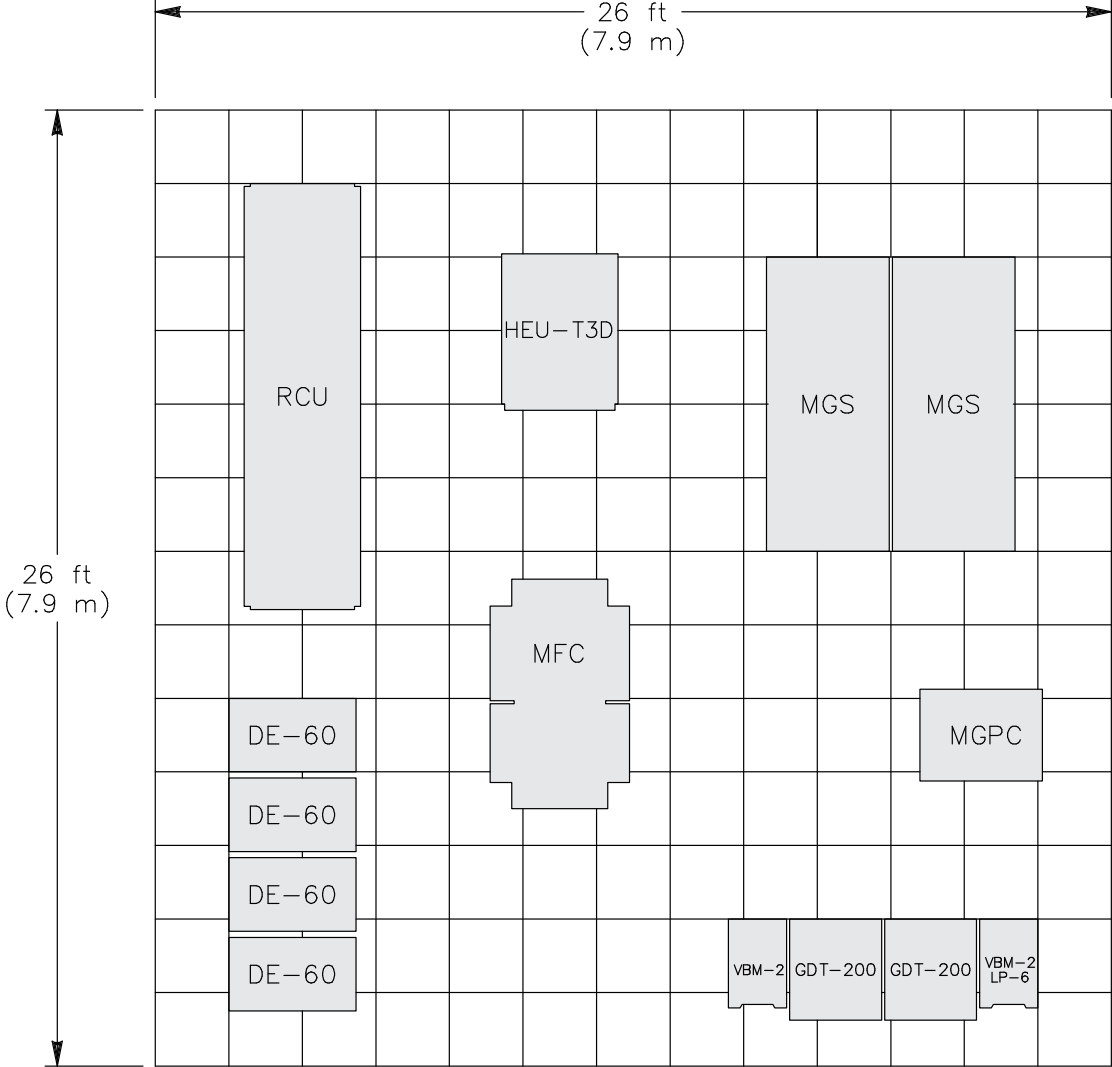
CRAY T3D SC Typical Computer Room Floor Plan
